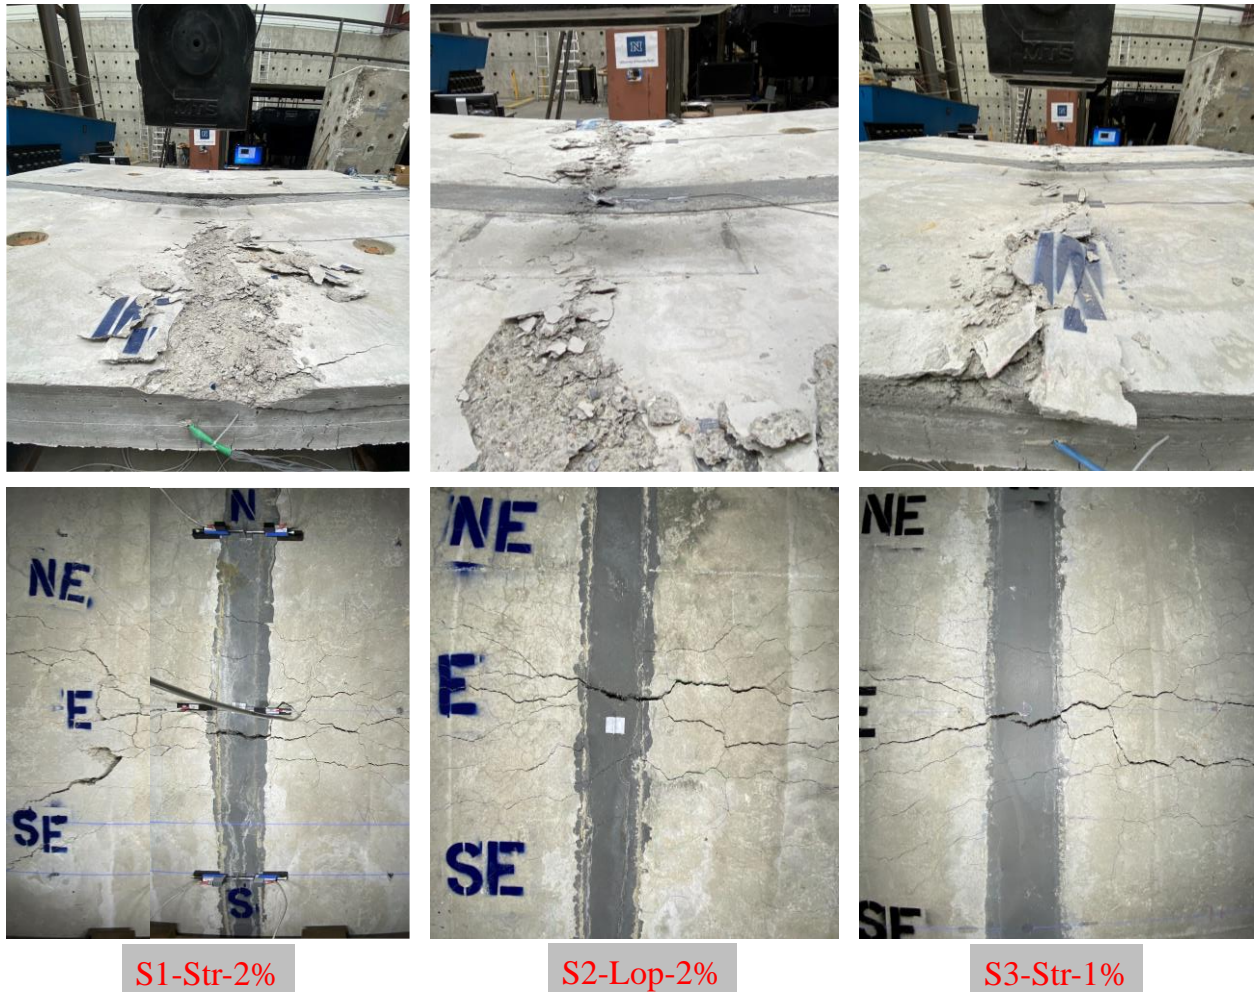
Crack pattern, damage and modes of failure at the top and bottom of the test specimens.
